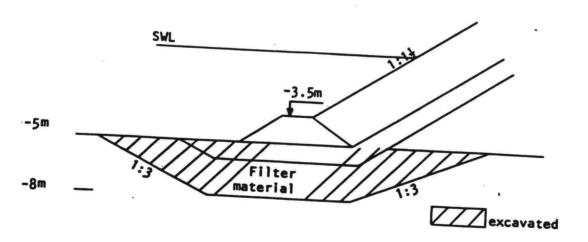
Shallow water (5m) dredged trench gravel filter.
